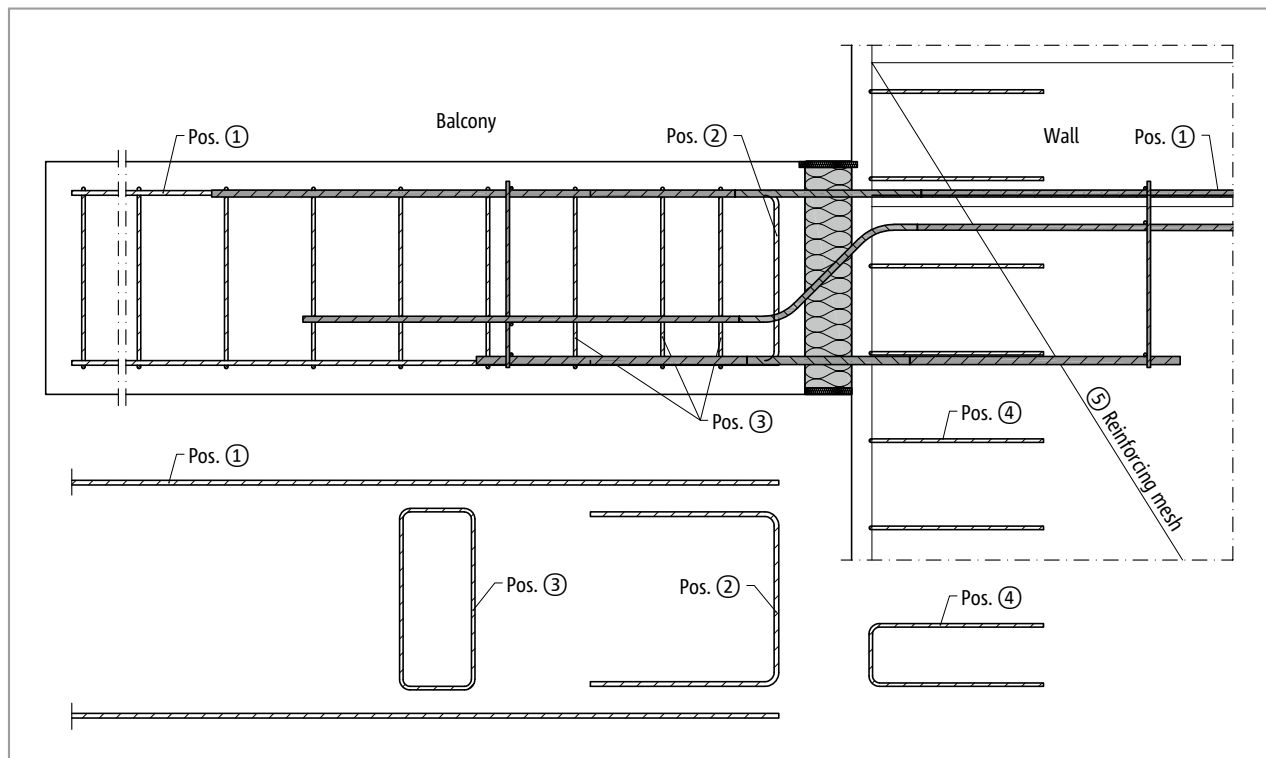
Schöck Isokorb® T type B: On site reinforcement (cross-section)
